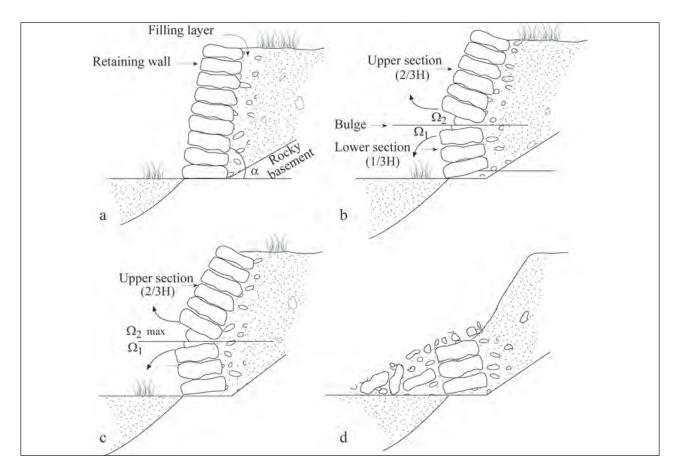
Stages in the process of wall collapse: a) retaining wall; b) bulge on the 1/3 lower section; c) bulge collapse; d) wall collapse.
